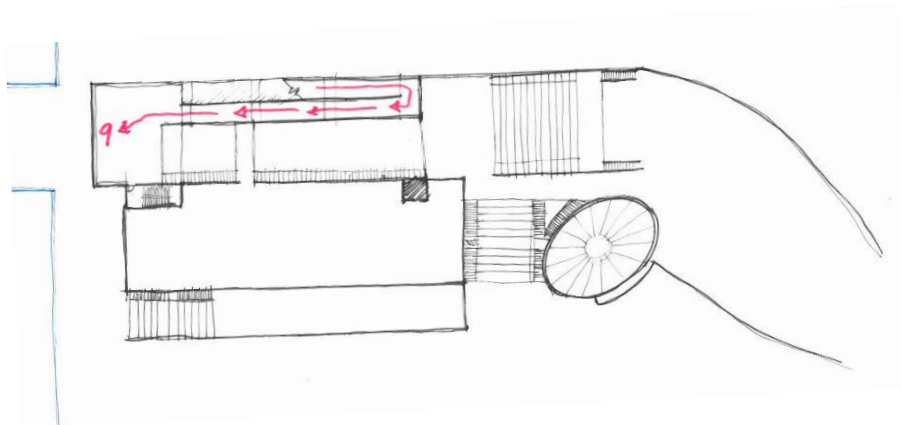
Roof Plan of “Bridge Flow” scheme, image by author.
